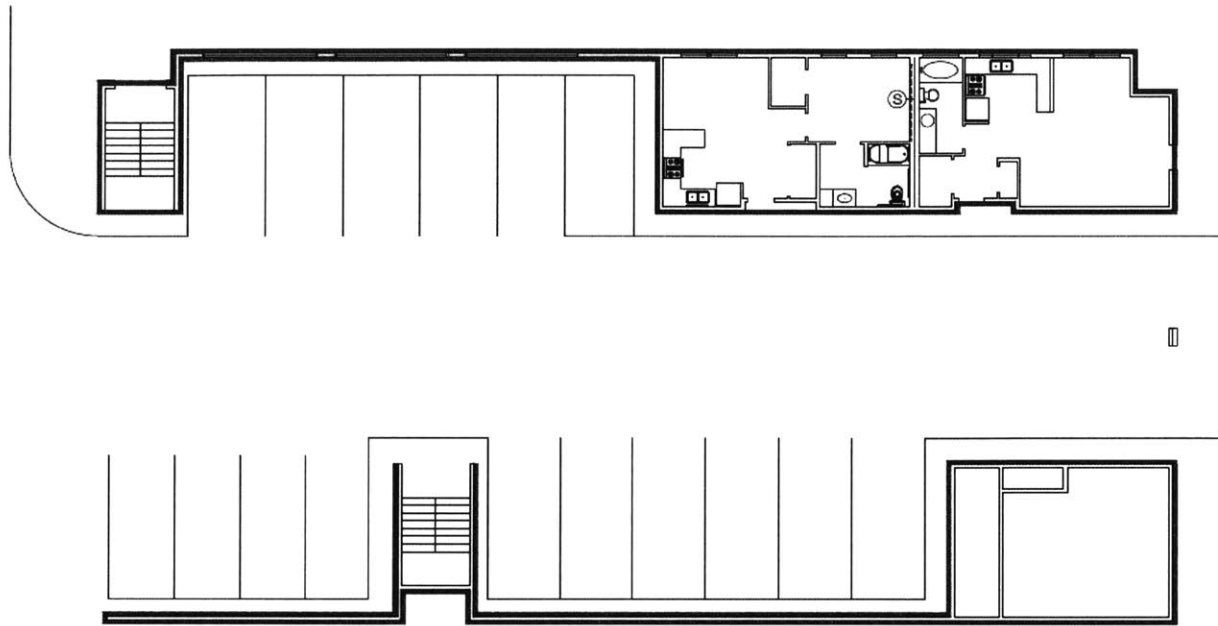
1st Floor Plan – 3 One Bedroom Units and 15 Parking Spots (Graphic Provided by Owner)
